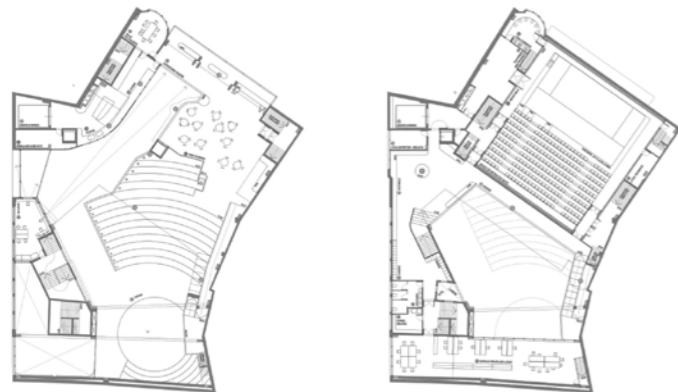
Ground floor and first floor plans of Theatre Des Varietes (Flores and Prats, 2020.) Retrieved at: <https://floresprats.com/>
